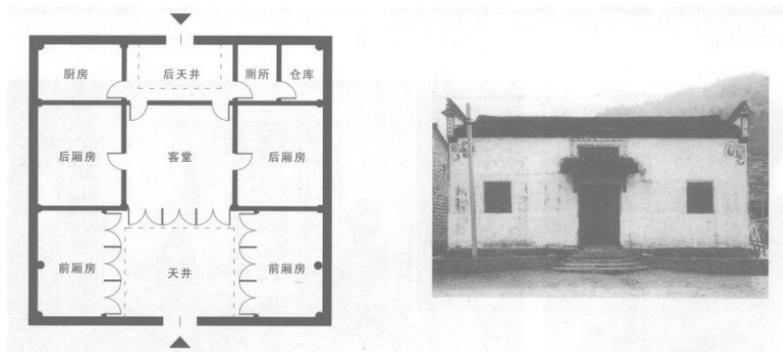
Plans and facades of traditional residential buildings in the south of the Yangtze River Source: " Shanghai housing after its opening to foreigners "
